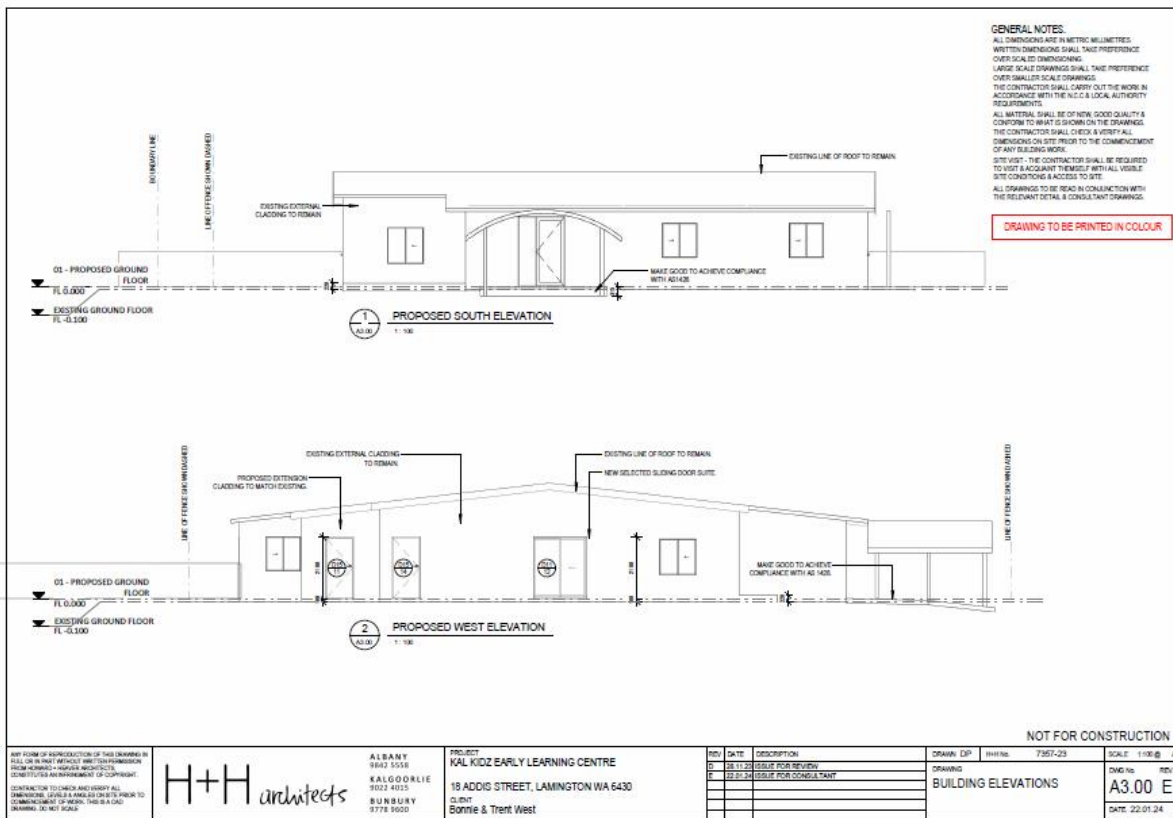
Building Elevations of No. 18 (Lot 4903) Addis Street, Lamington
